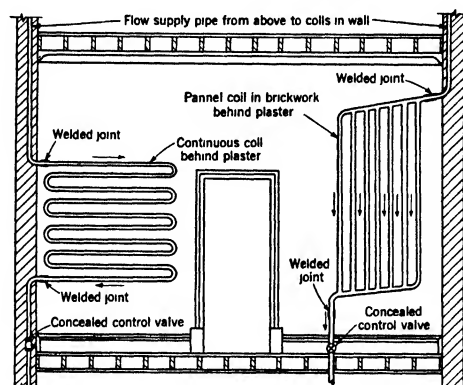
PIPE COILS LOCATED IN INTERIOR WALL SURFACES
